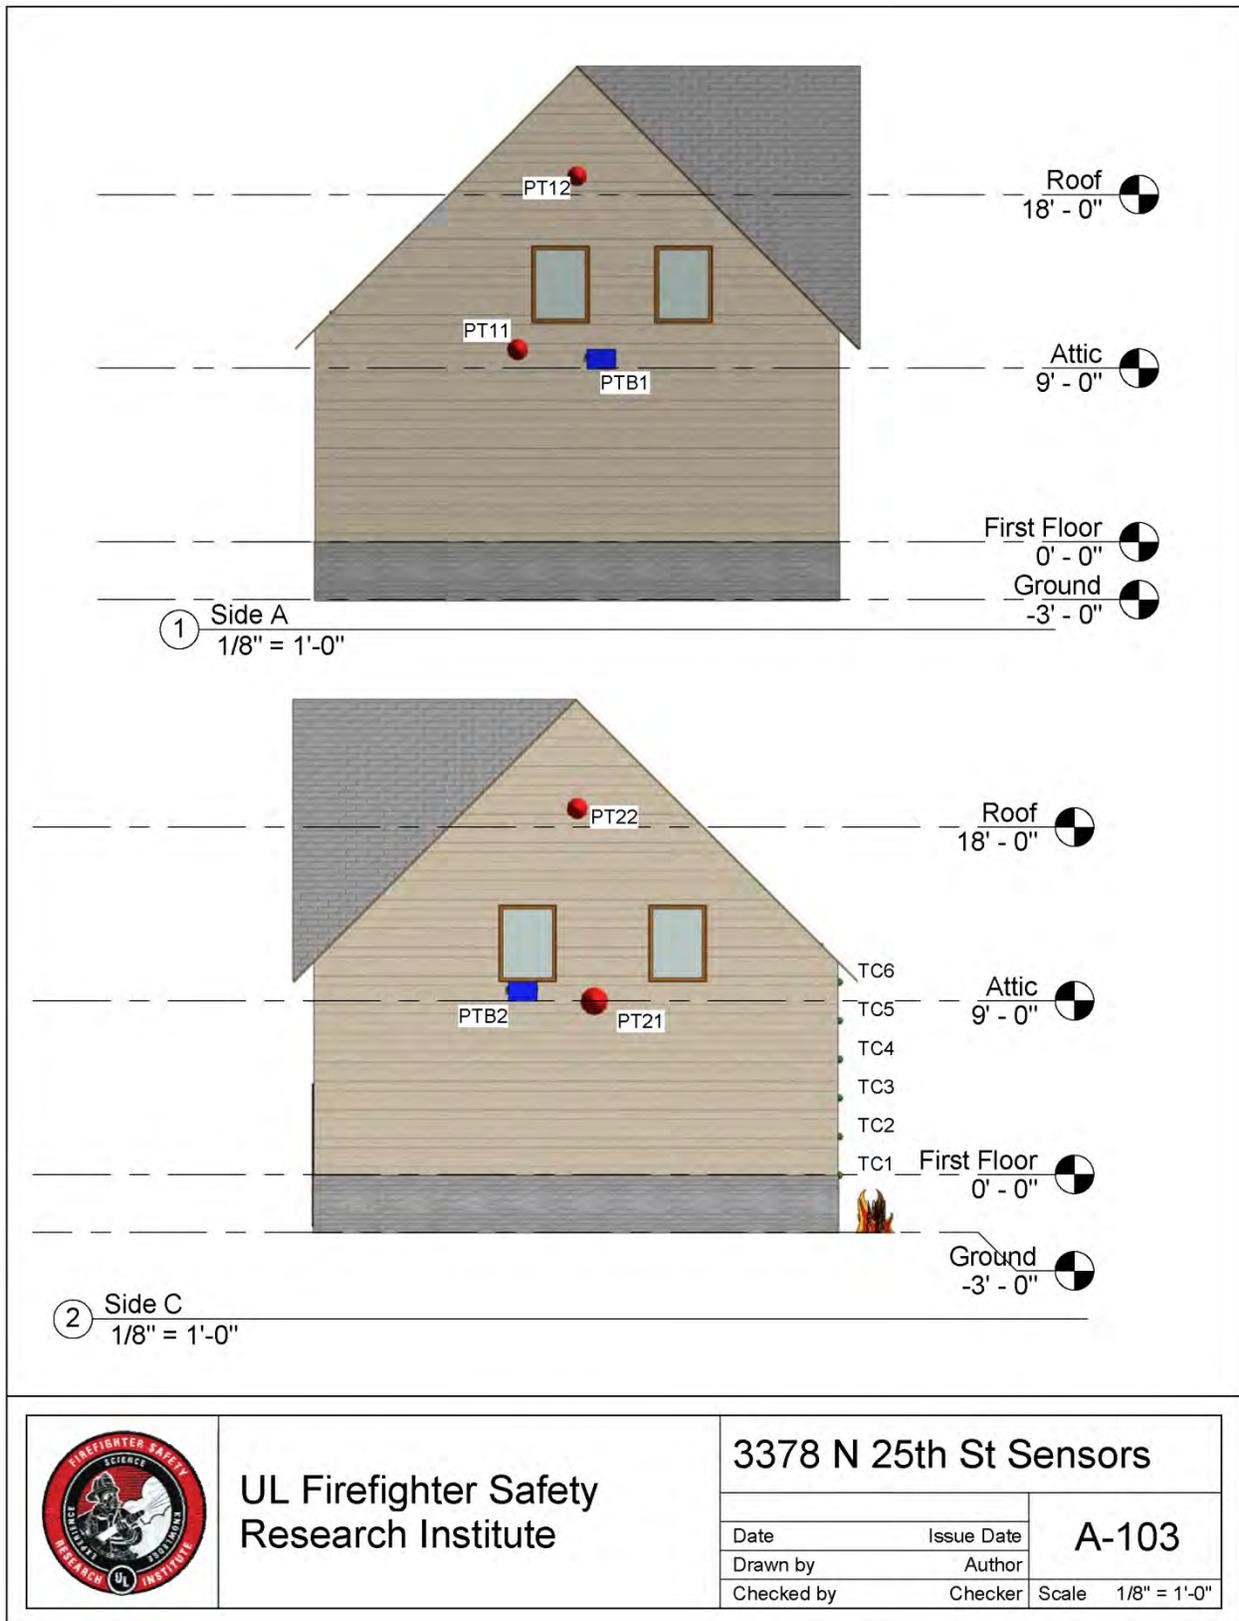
Field Experiment 3 – 3378 N 25h Street Sensors Side A & Side C Elevations
